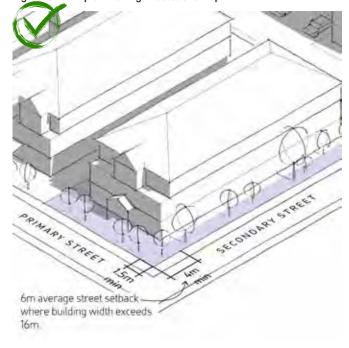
Multiple Dwellings - Street Setbacks Example Diagram
